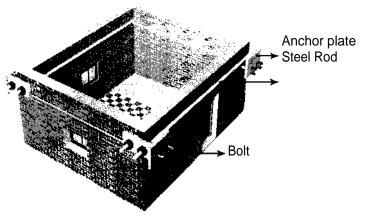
Retrofitting of load bearing buildings by pre-stressing
